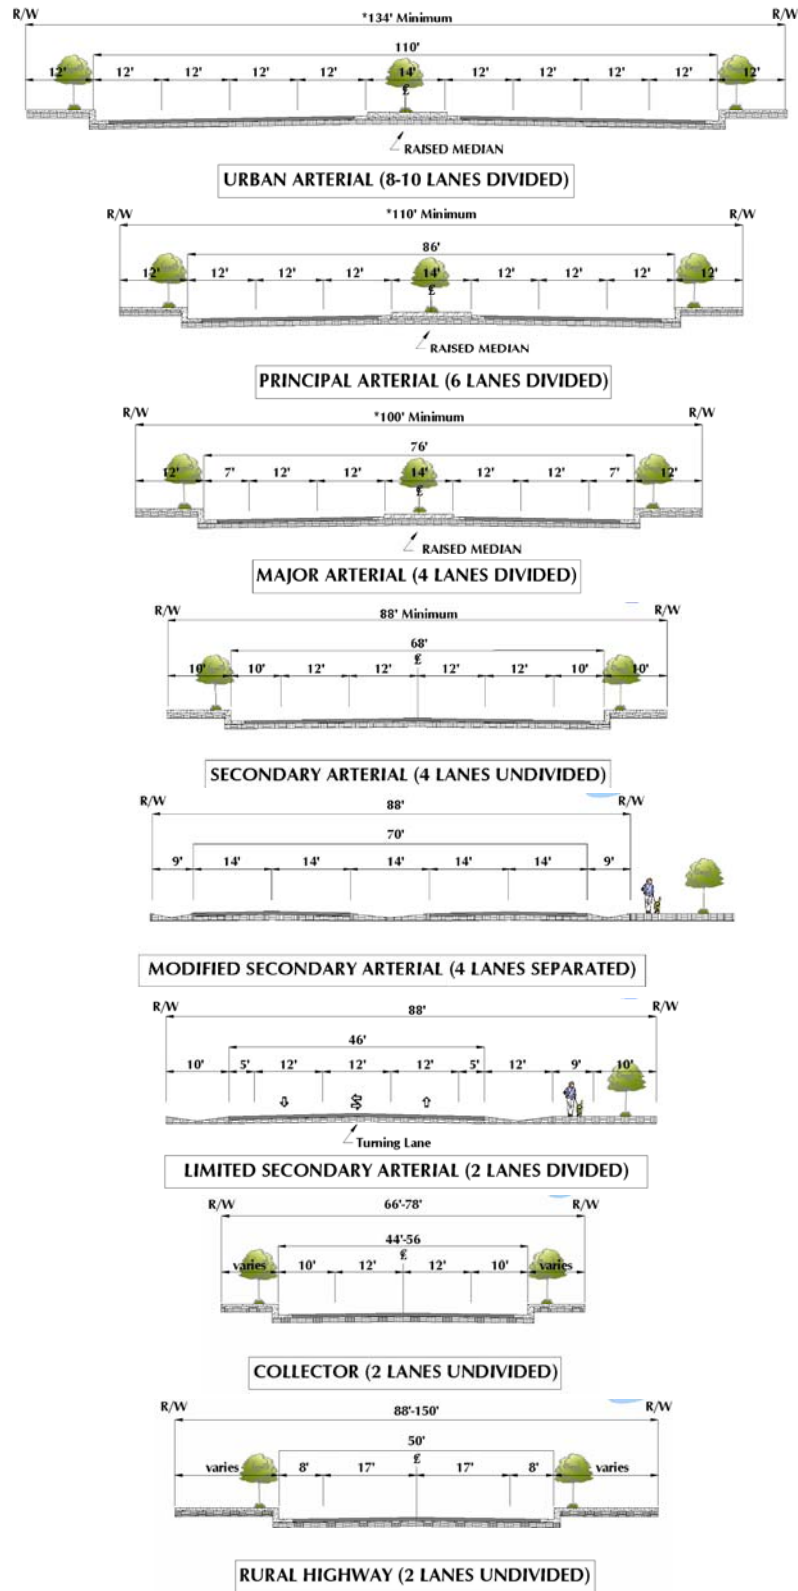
CITY OF TEMECULA GENERAL PLAN ROADWAY CROSS-SECTIONS
